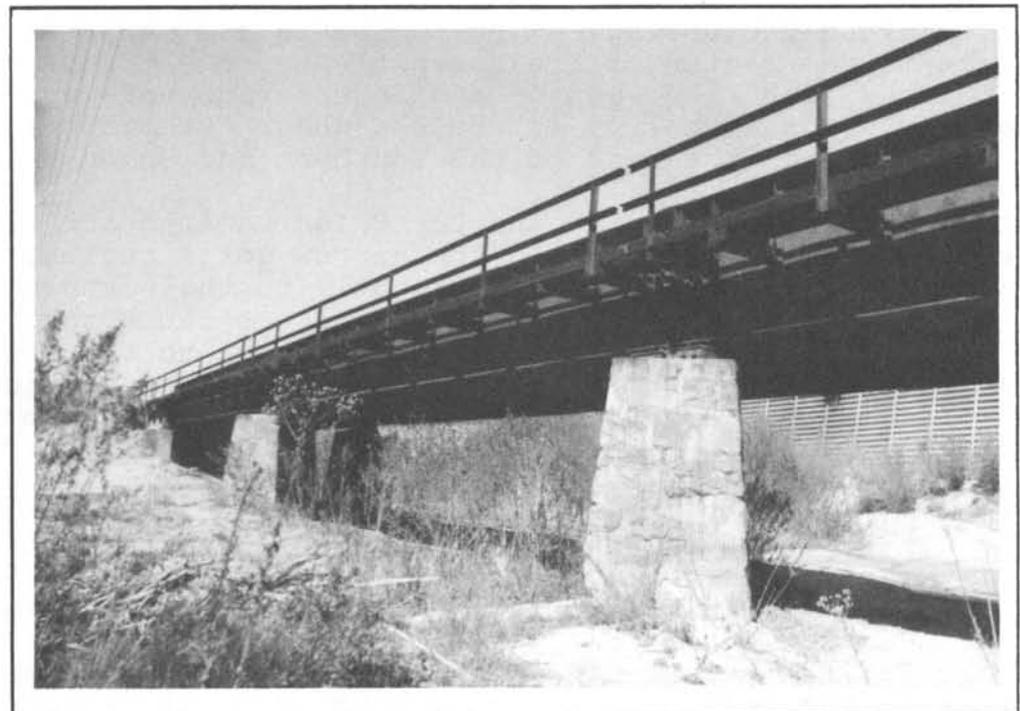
Rubble Pier Railroad Bridge in Cajon Creek Near Cajon Junction
